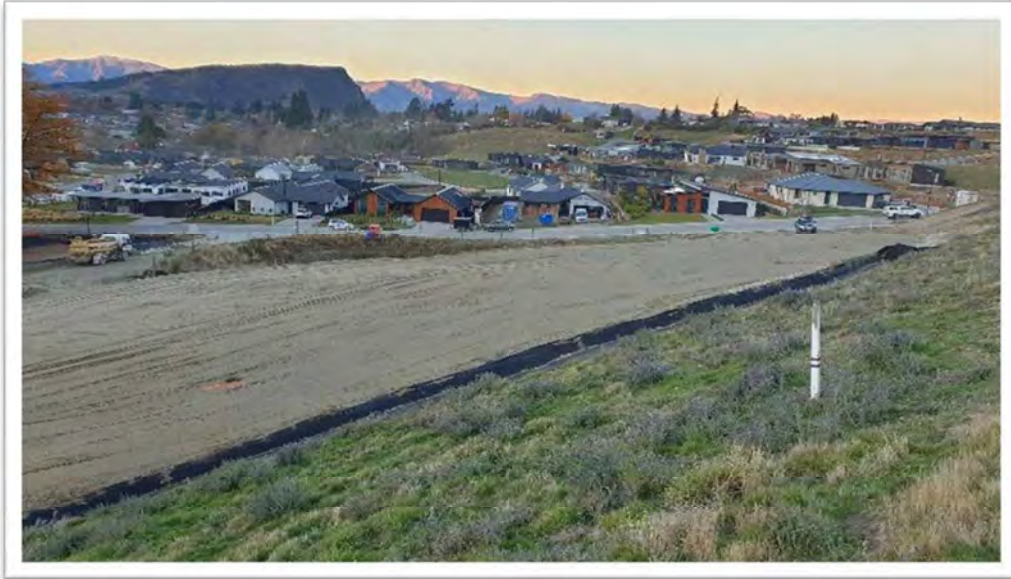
SITE PHOTO LOOKING SOUTHWEST ALONG TOE OF VEHICLE ROW EXCAVATION.
